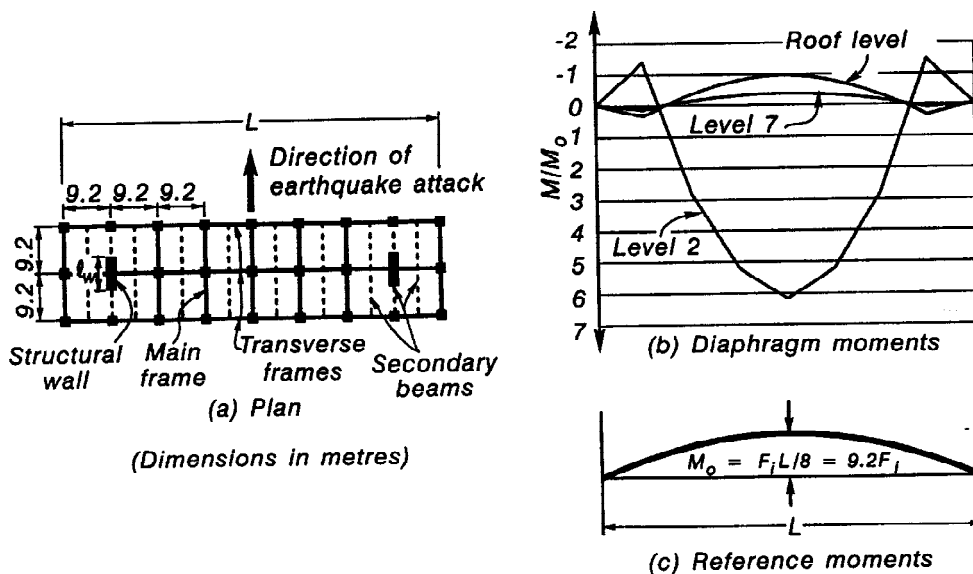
Diaphragms in a 12 storey example wall-frame system.
